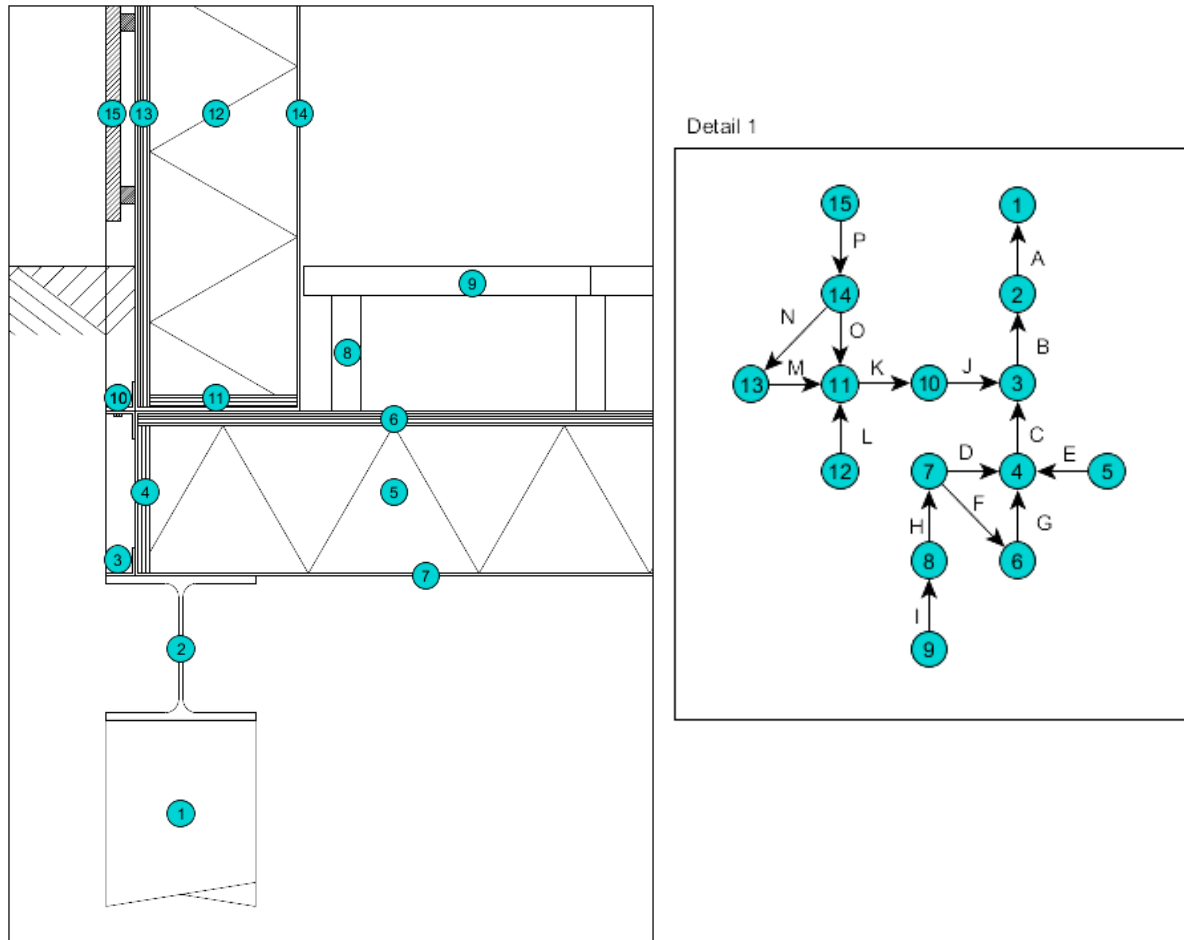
Detail drawing of BILT (BILT, 2018) and relational pattern of one assembly on building level 5 & 6
